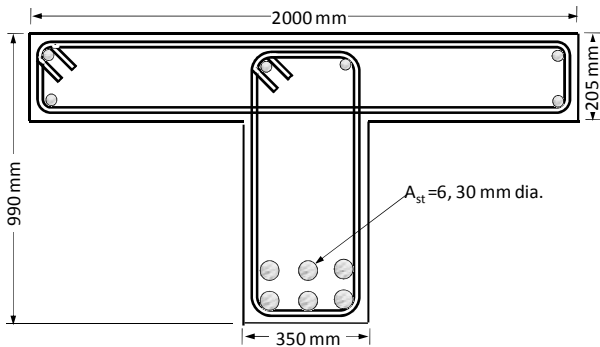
Cross-sectional details of reinforced concrete bridge girder
